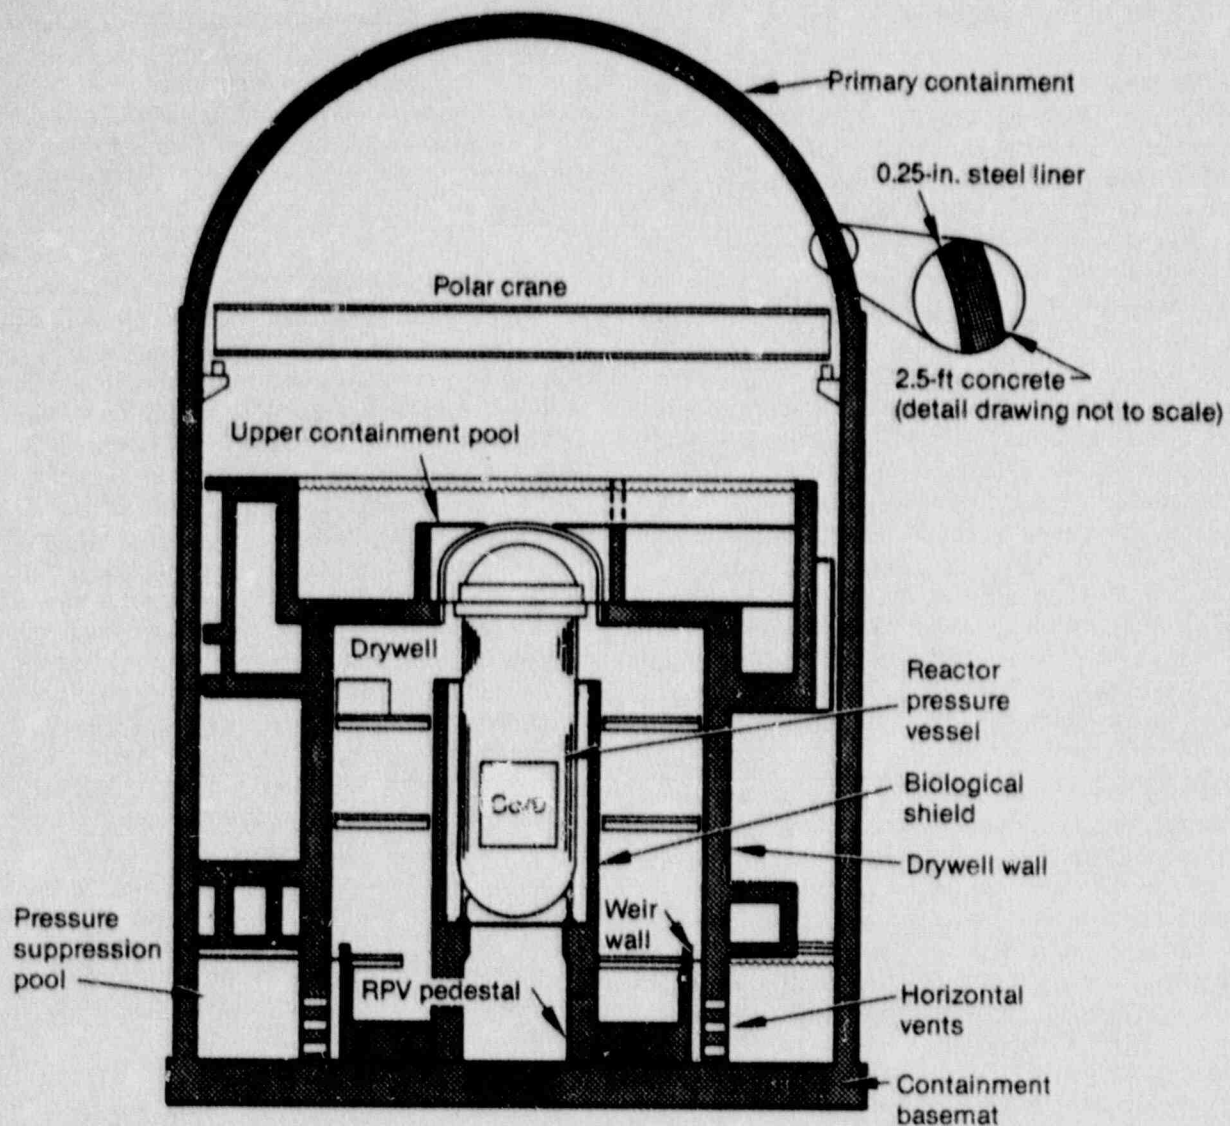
BWR Mark II type reinforced concrete containment enclosed in a reactor building.
